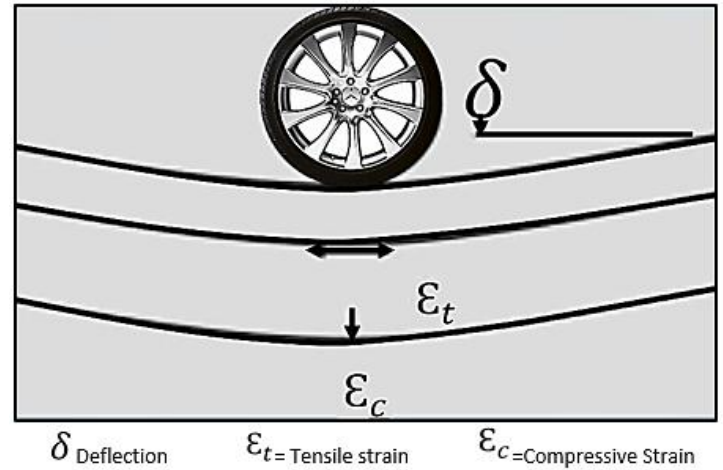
Types of stresses within a road pavement structure (IRC-37, 2021).
